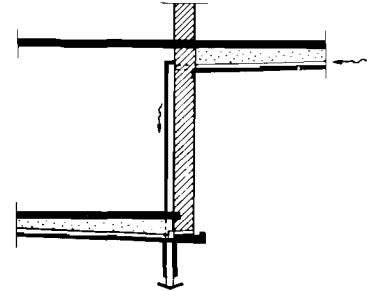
Principle of buoyancy ventilation through taller, heated neighbouring building.
